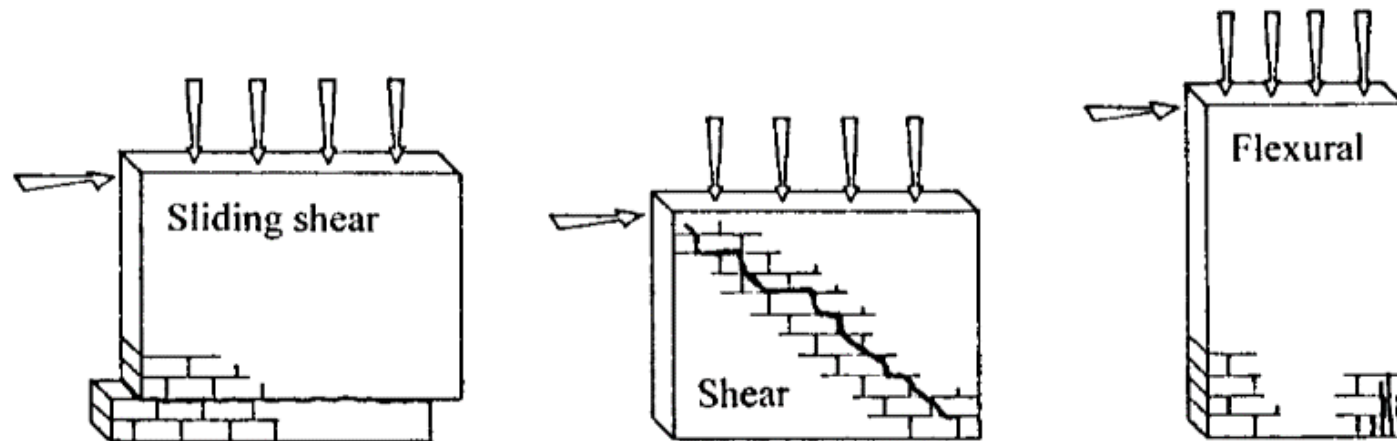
Typical failure modes of masonry walls, subjected to in-plane seismic load.
